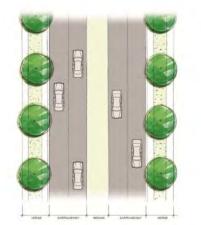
Indicative Layout of a Four Lane Sub-Arterial Road
